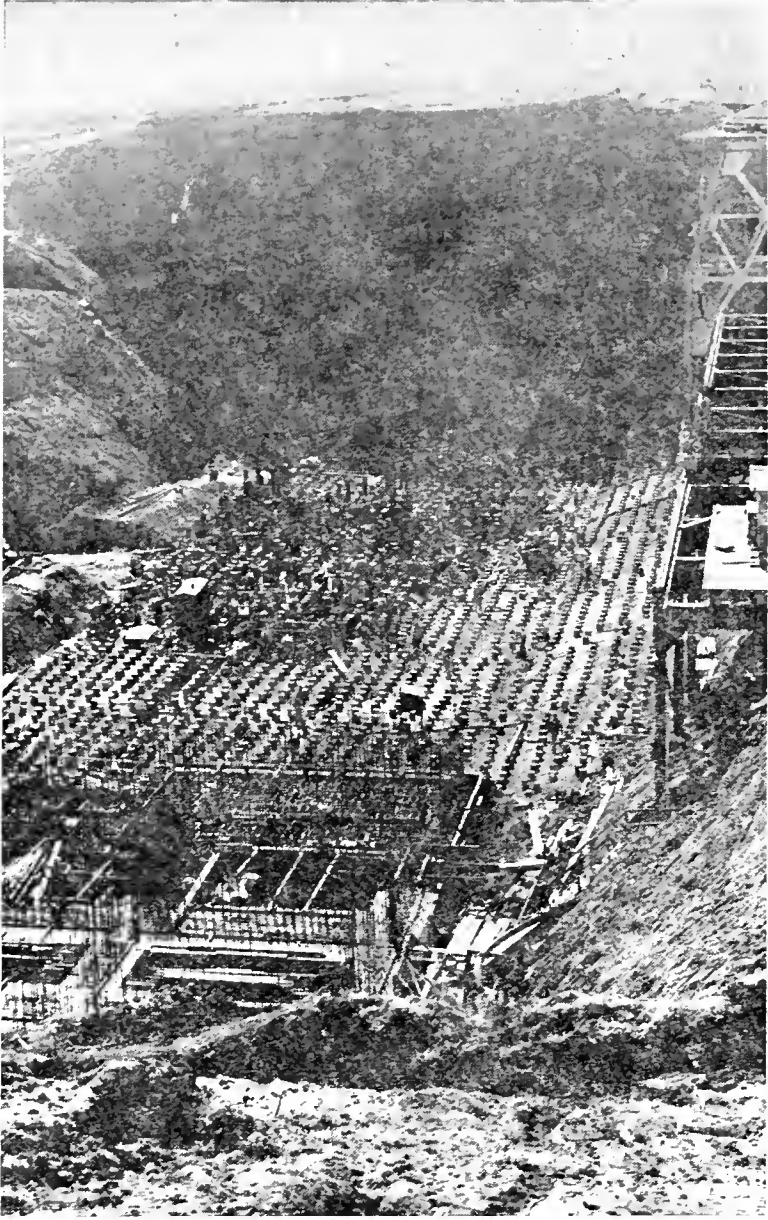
Foundation of the Delta-Mendota Pumping Plant under construction, July 8, 1948
